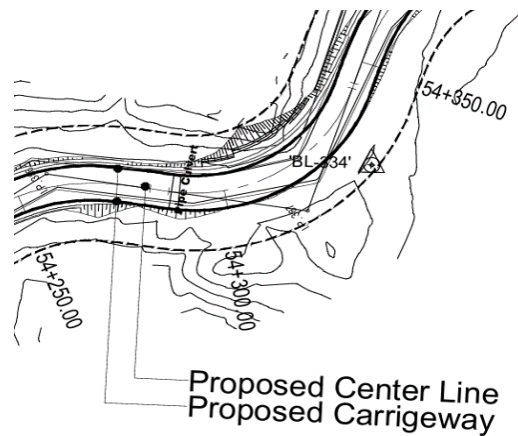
Proposed section of Pavement at Bishaltar, Dhading (54+290-54+350CH) [8]
